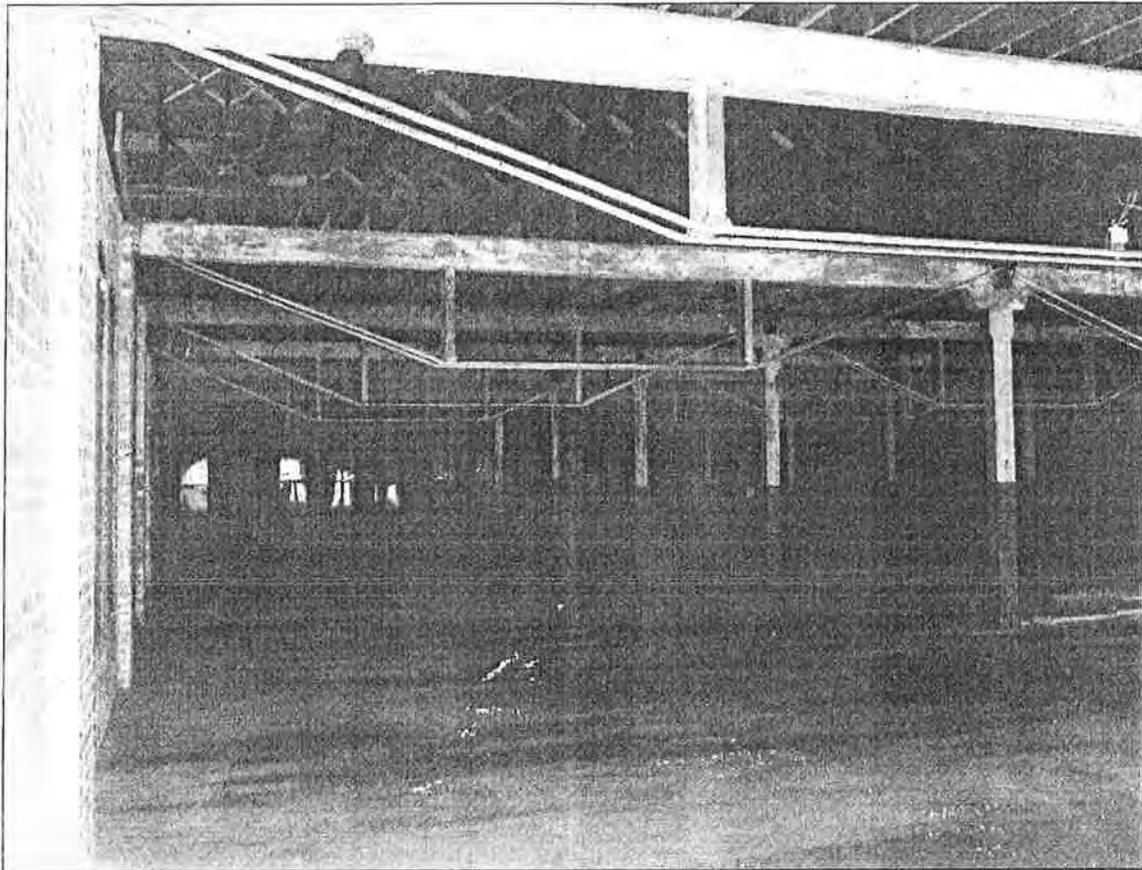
Relieving (tension) arches on the third floor, looking north (Jacobsen, 2008)
